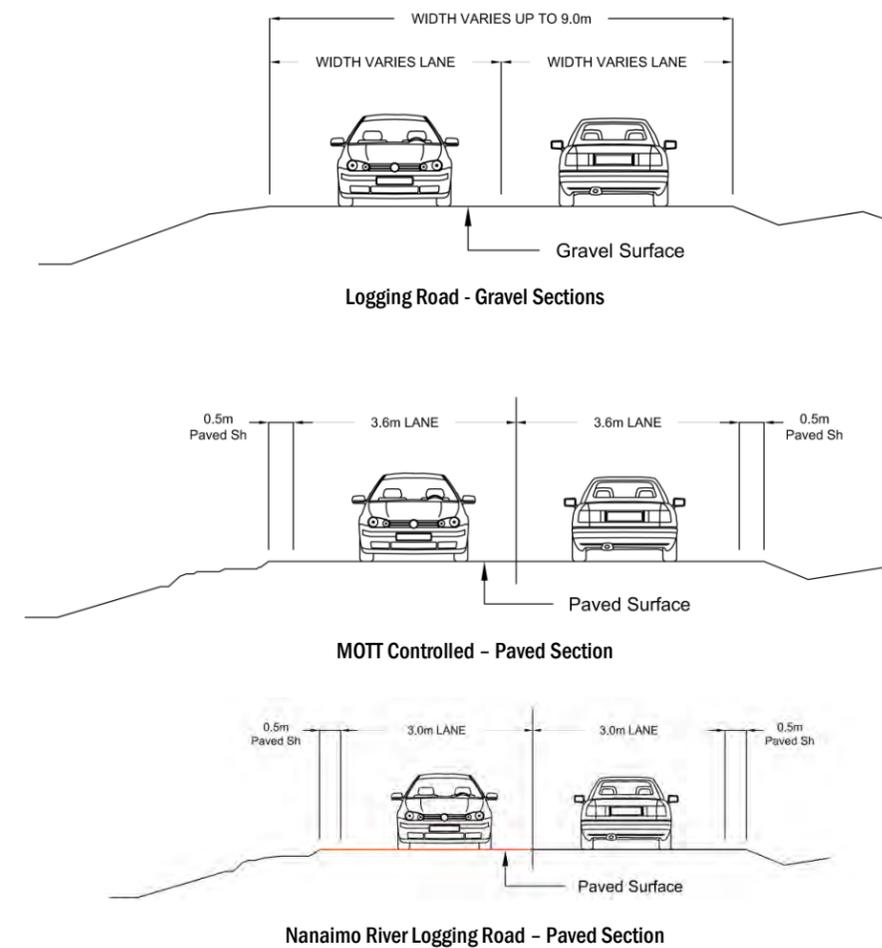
ROUTE 2A - TYPICAL CROSS SECTIONS
